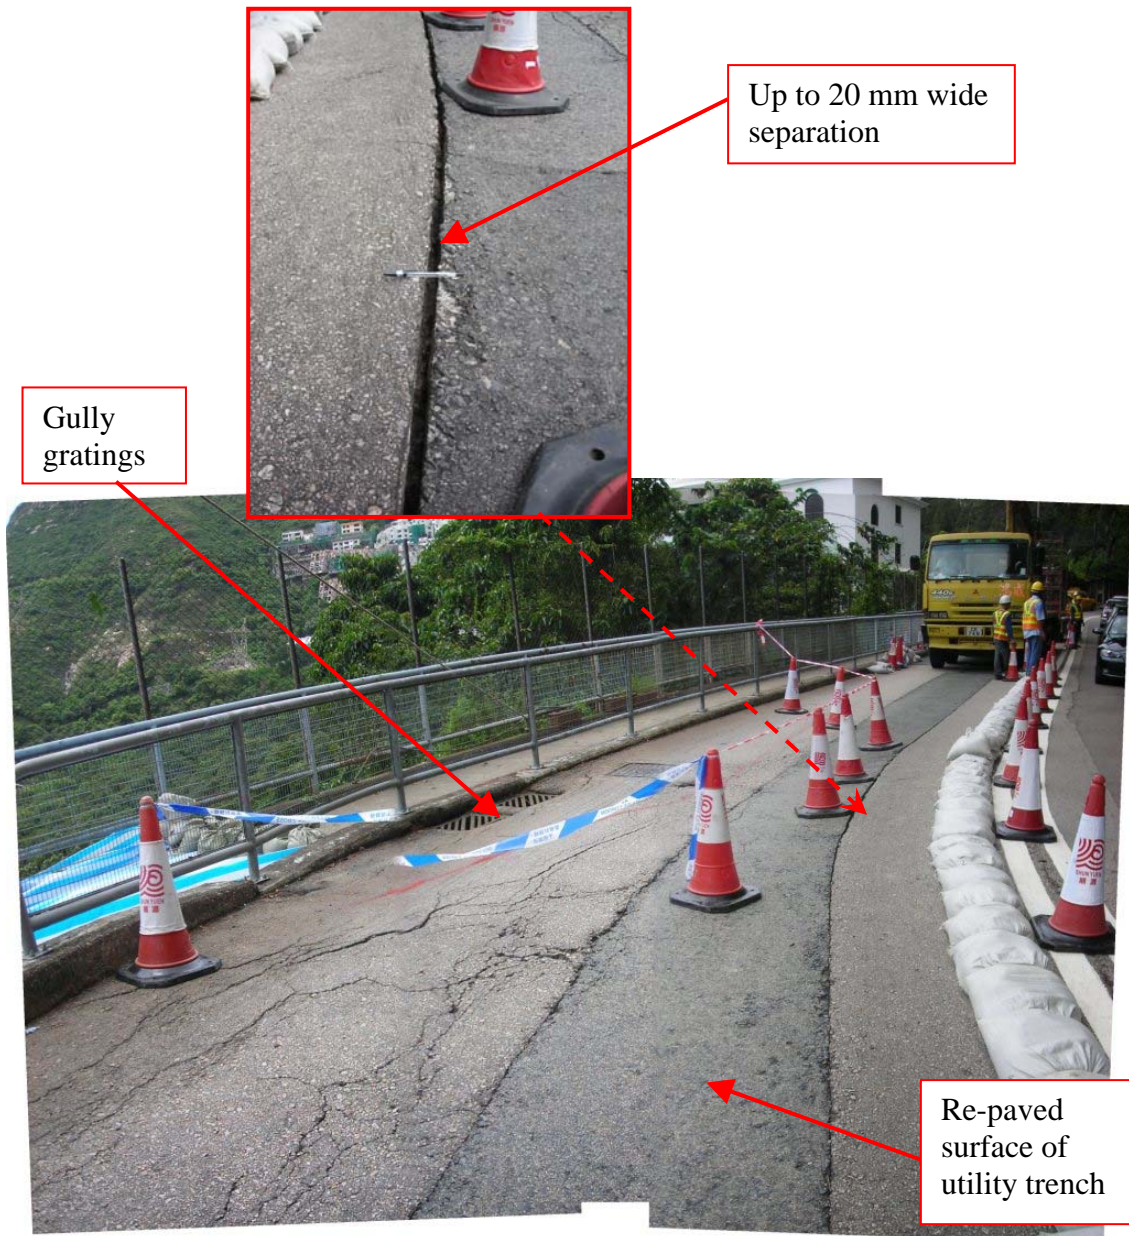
Condition of the Road Pavement above the 30 June 2007 Landslide Site before HyD's Urgent Repair Works (Photograph taken on 30 June 2007)
